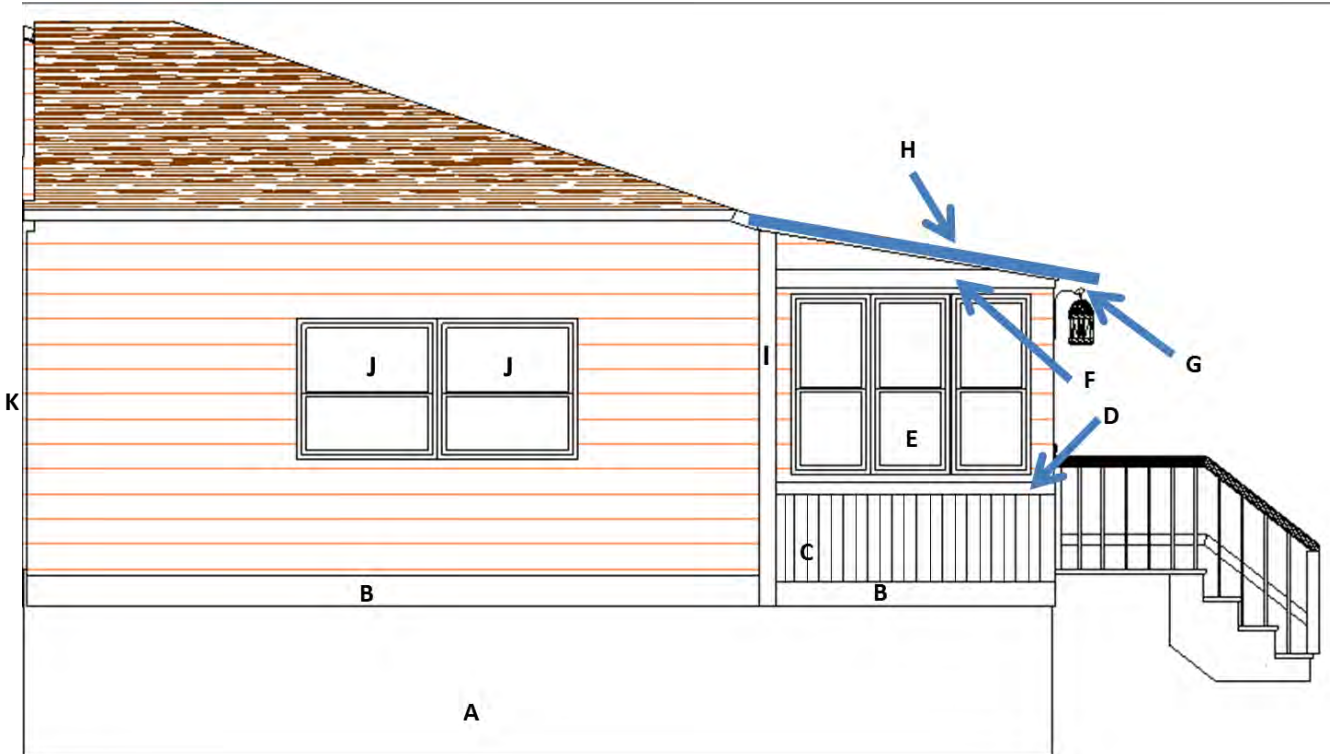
Outlined elevation view of the applicants rear wall plan
